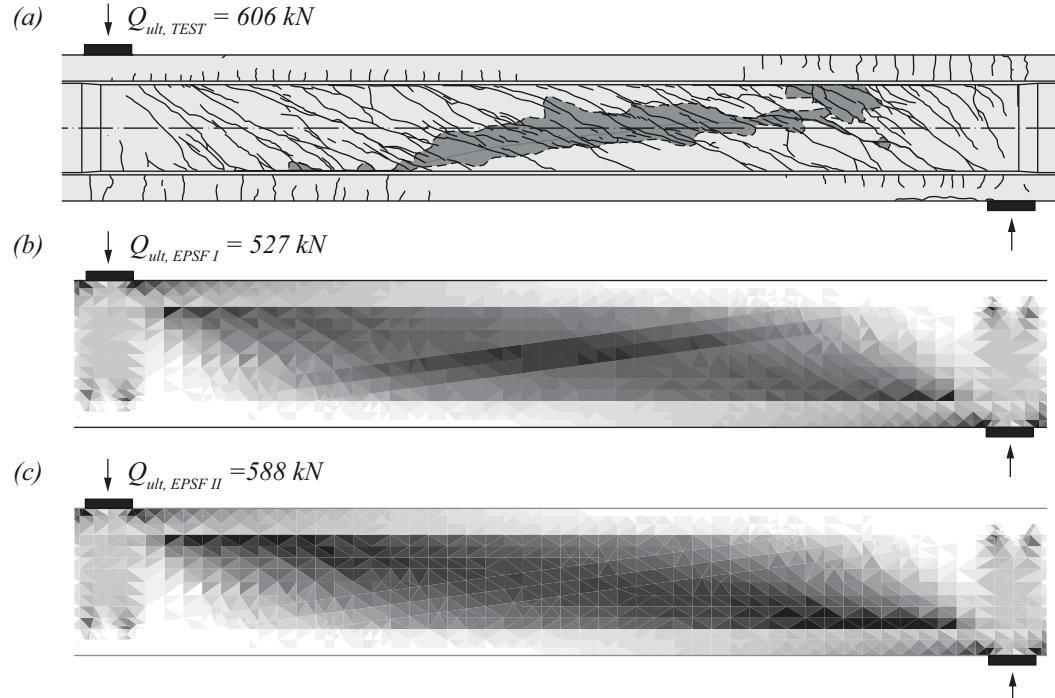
Prestressed beam SR27 tested by Rupf – observed failure mechanism (a); failure mechanism obtained with EPSF method after applying the k_c factor according to SIA262:2013 (b); failure mechanism obtained with EPSF method with no reduction of the web thickness (c)
